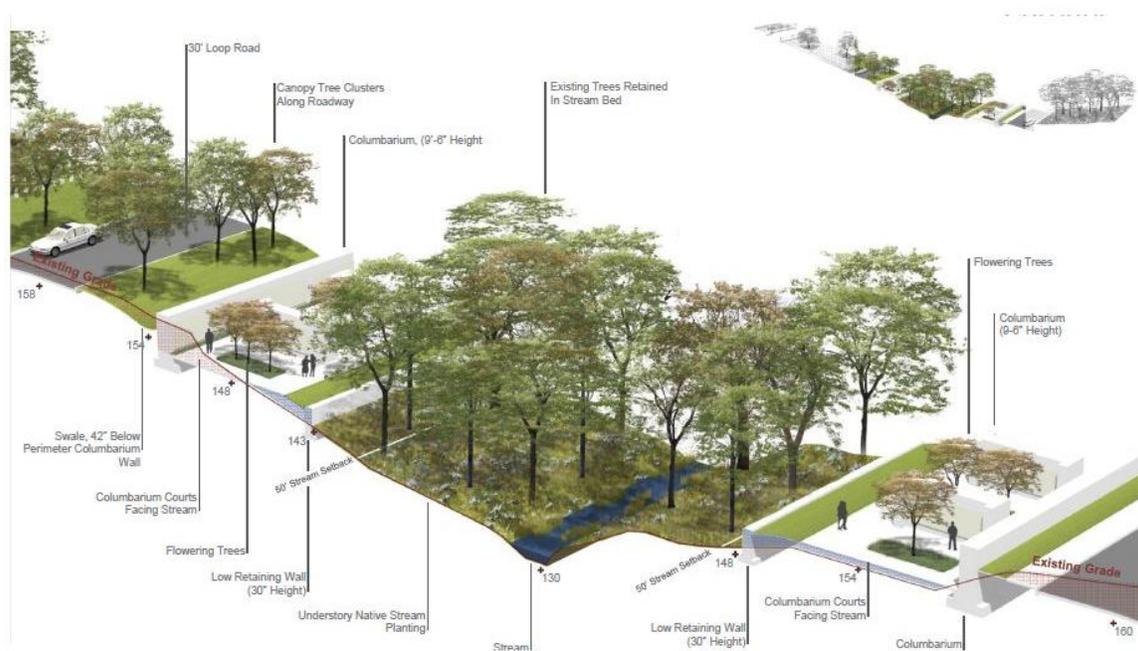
Site Section Detail – Stream restoration area and Columbarium Courts
